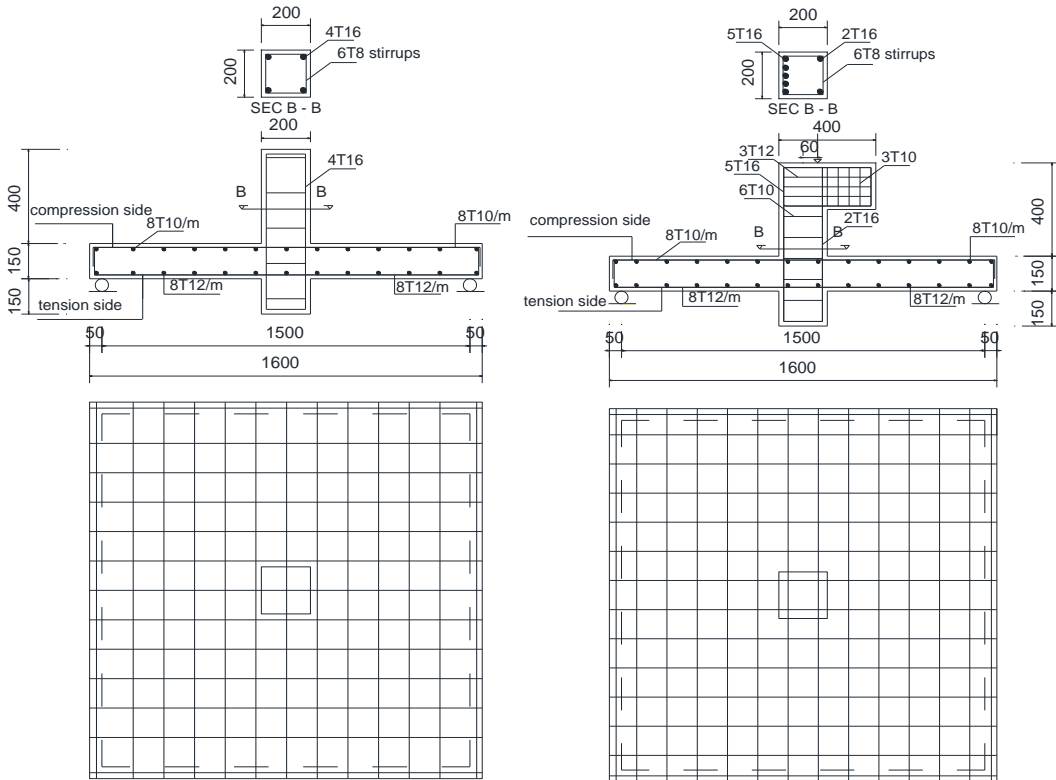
Reinforcing schemes, a) Control under centric load, b) Control eccentric load. (All dimensions in mm)
